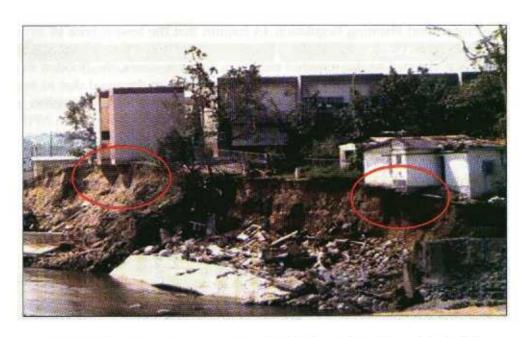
Riverbank erosion resulted in the undermining of the building foundations of a school (pink building) and house (white building) in Jayuya.
